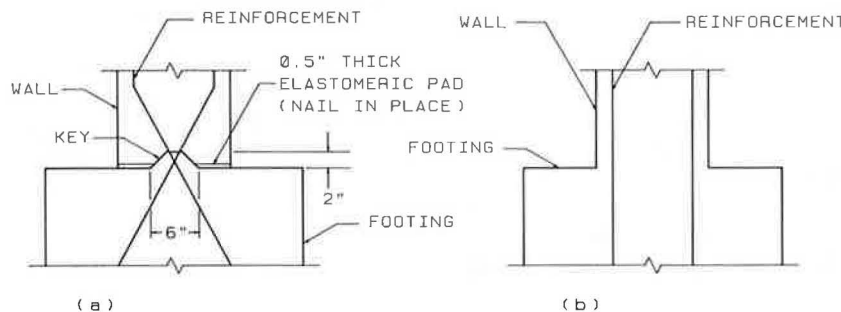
Typical details at the bottom of the abutment wall: (a) pinned base, and (b) fixed base.
